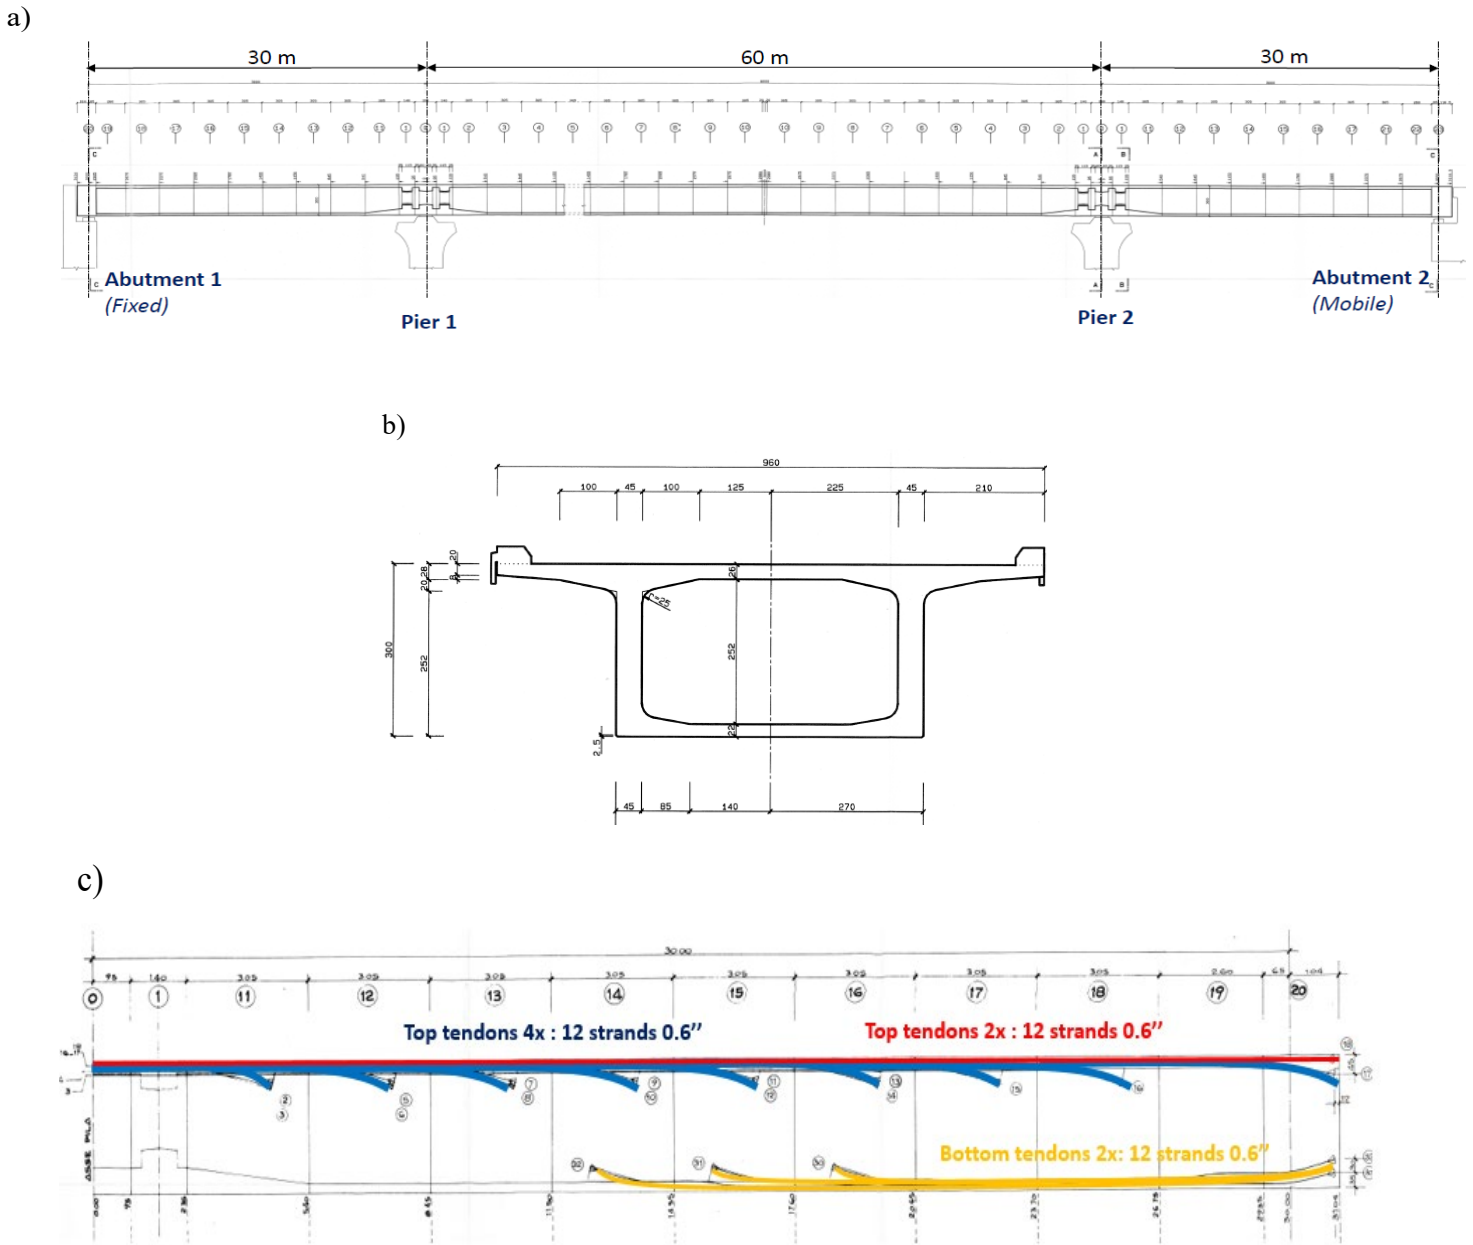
Geometrical configuration of the bridge (a); Typical segment cross section (b); prestressing tendons layout for the half hammer of span between abutment 1 and pier 1 (c) (dimensions in [cm]).
